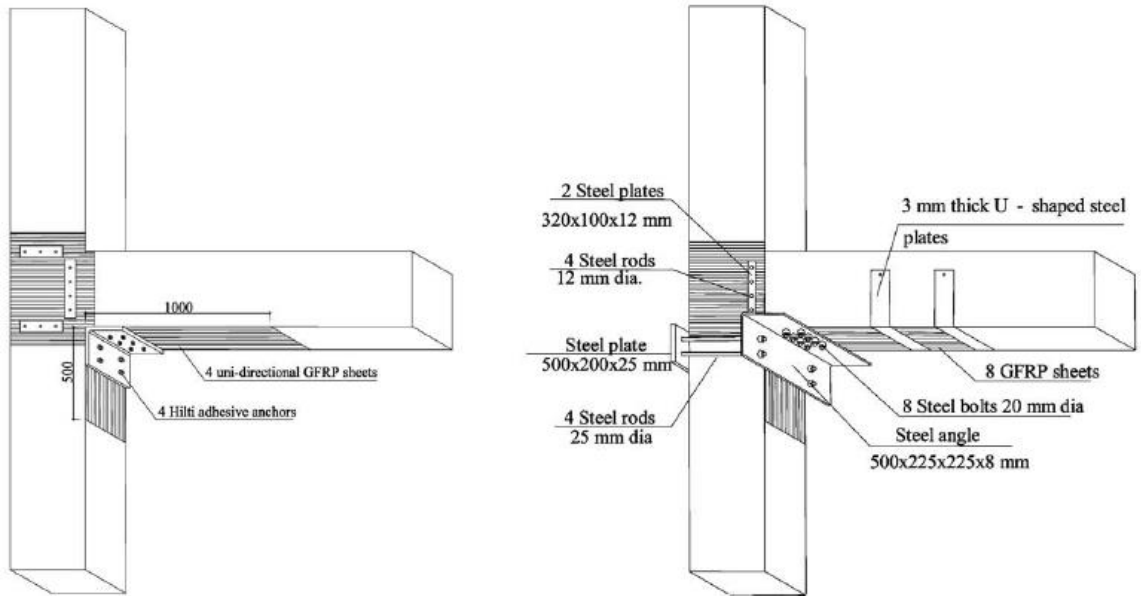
Retrofitting schemes: (a) Specimen TR1, (b) Specimen TR2 [El-Amoury and Ghobarah 2002]
